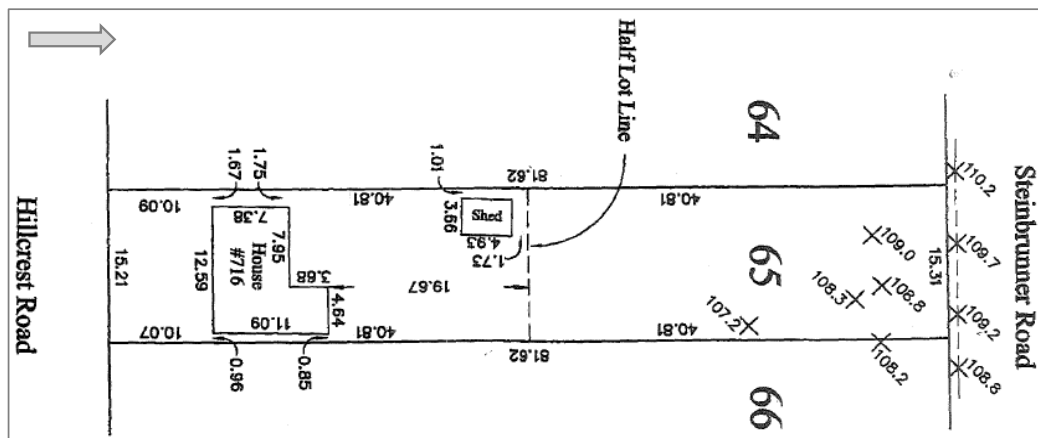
Proposed subdivision plan for 716 Hillcrest Rd – note the shed in this plan has been moved to the east side of the property as shown in Attachment A.
